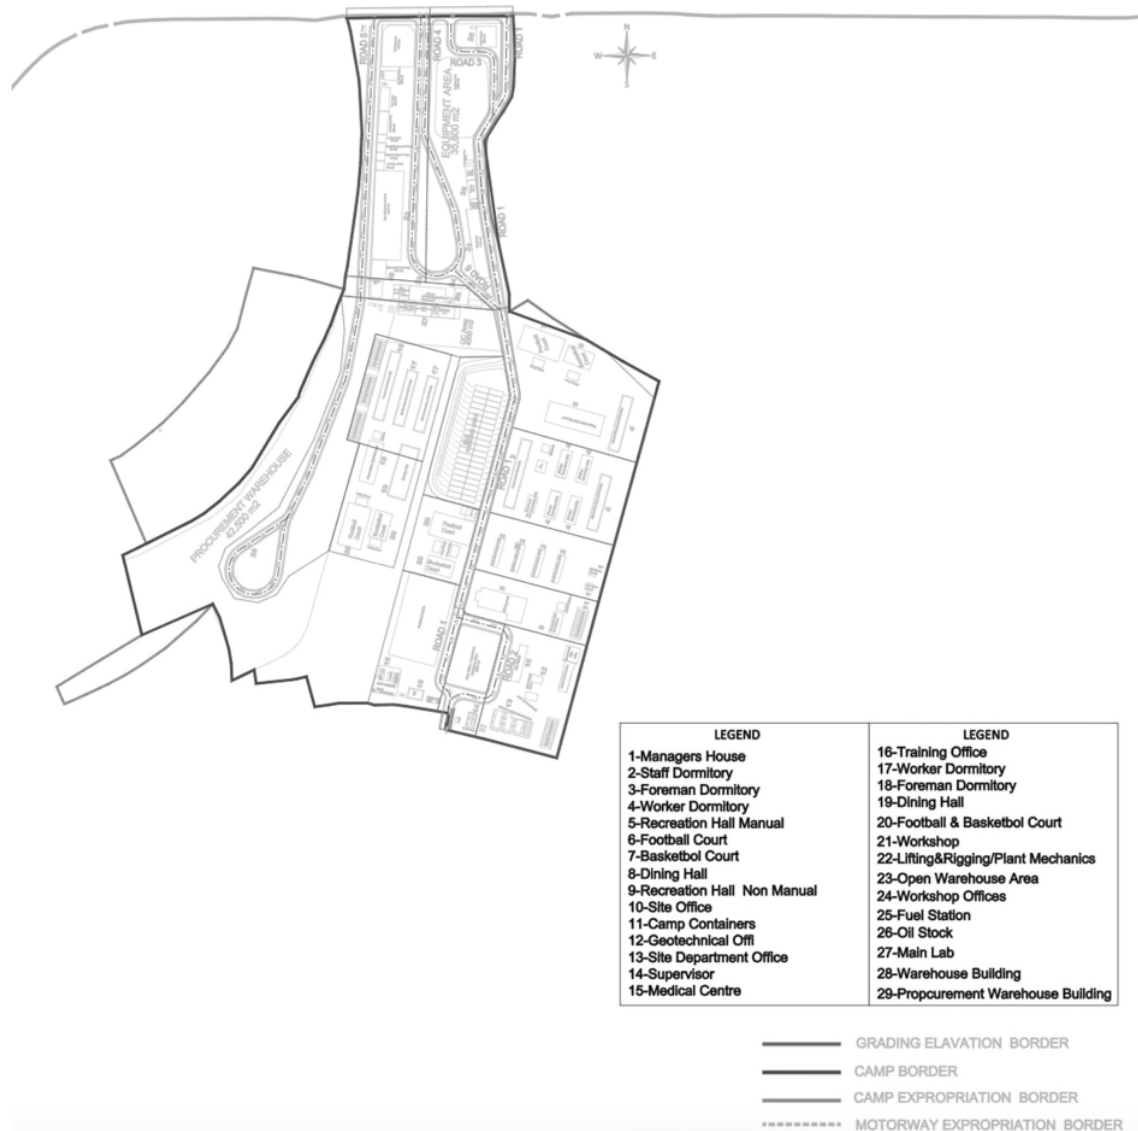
Layout of Camp Area in Section-1 (Krusevac).
